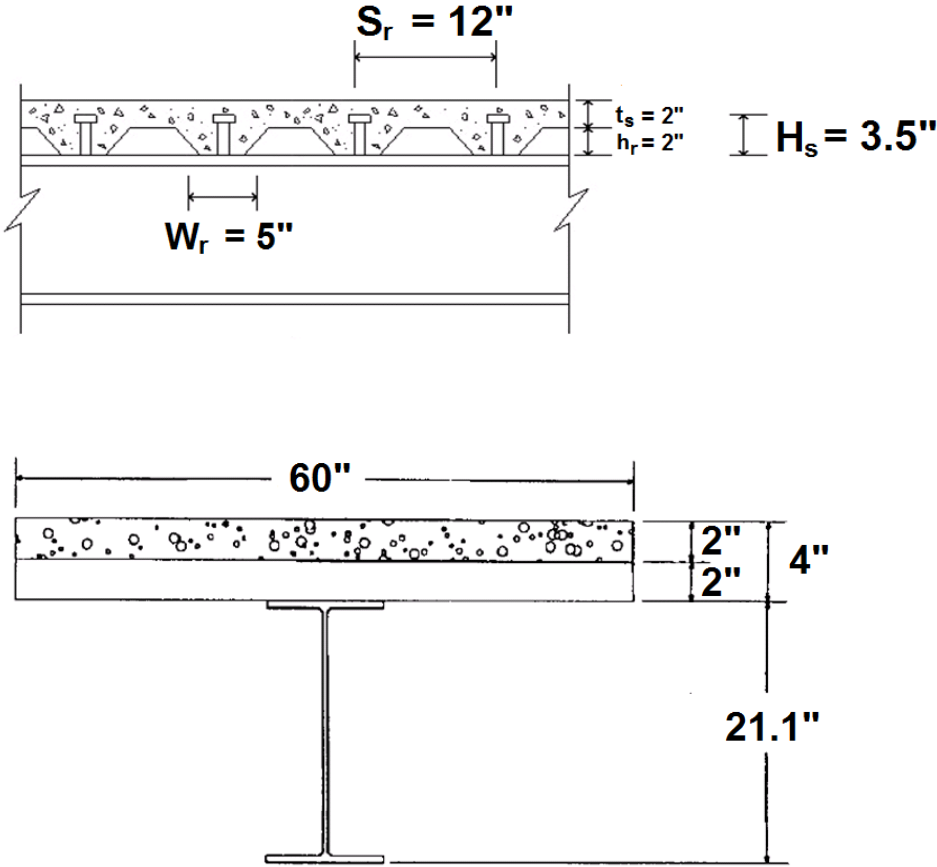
(Top) Cross-section of composite floor deck with ribs perpendicular to steel beam [51]. (Bottom) Cross-section of effective width of W21X68 steel section [51].
